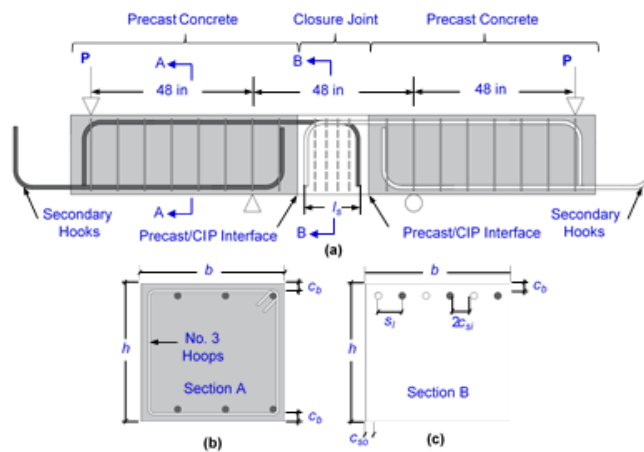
Typical Beam-Splice Specimen (a) Elevation View (b) Section through Shear Span, (Coleman, 2024)
